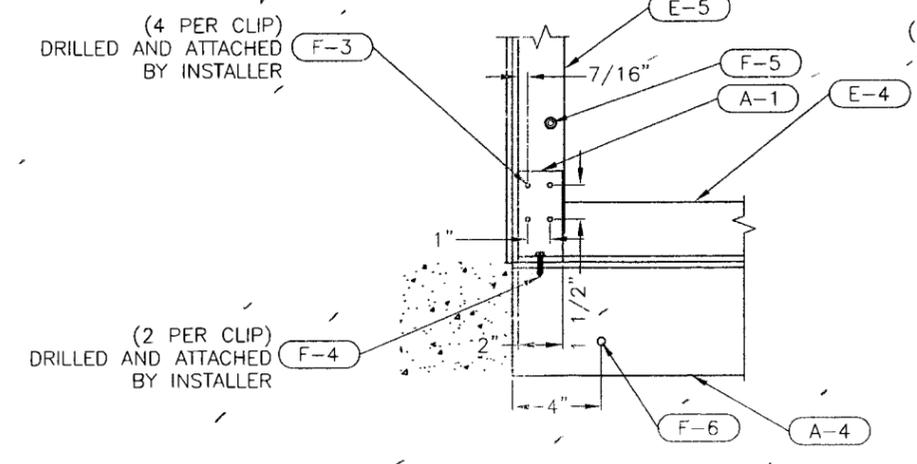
DETAILS FOR CONCRETE / REINFORCED BLOCK CONDITION
